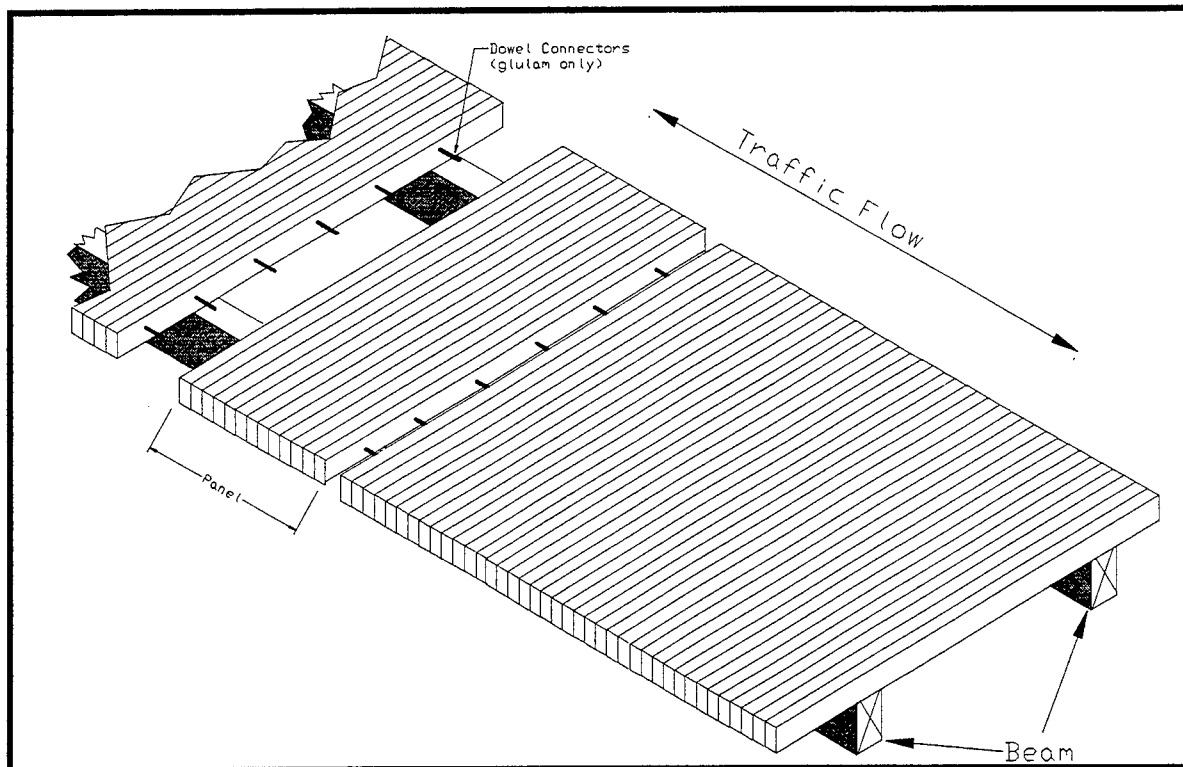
Beam Bridge with Transverse Laminated Deck
